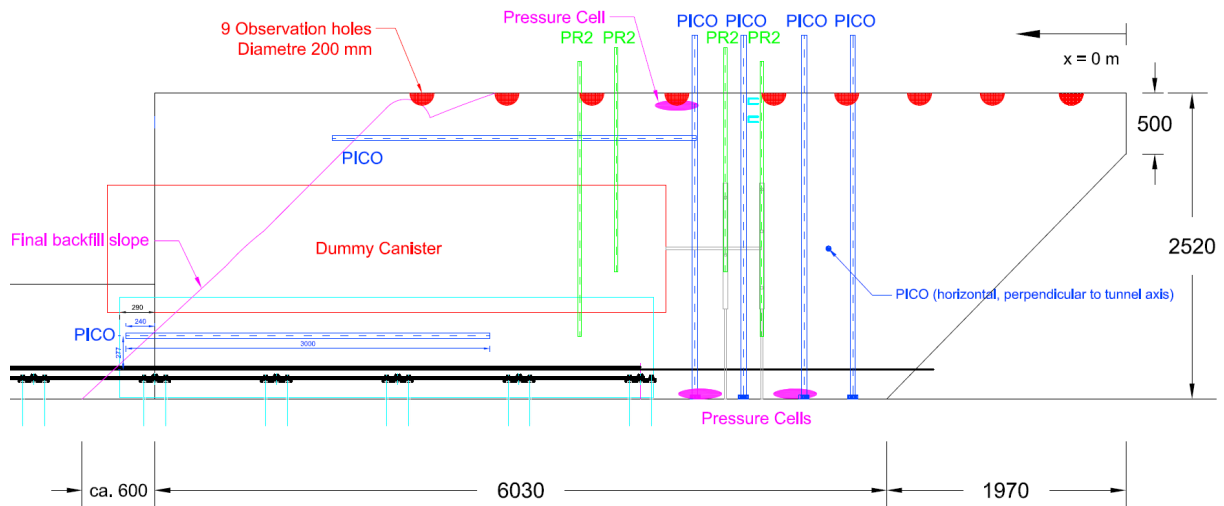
Longitudinal section of the test tunnel rig with installations for local density estimation.
